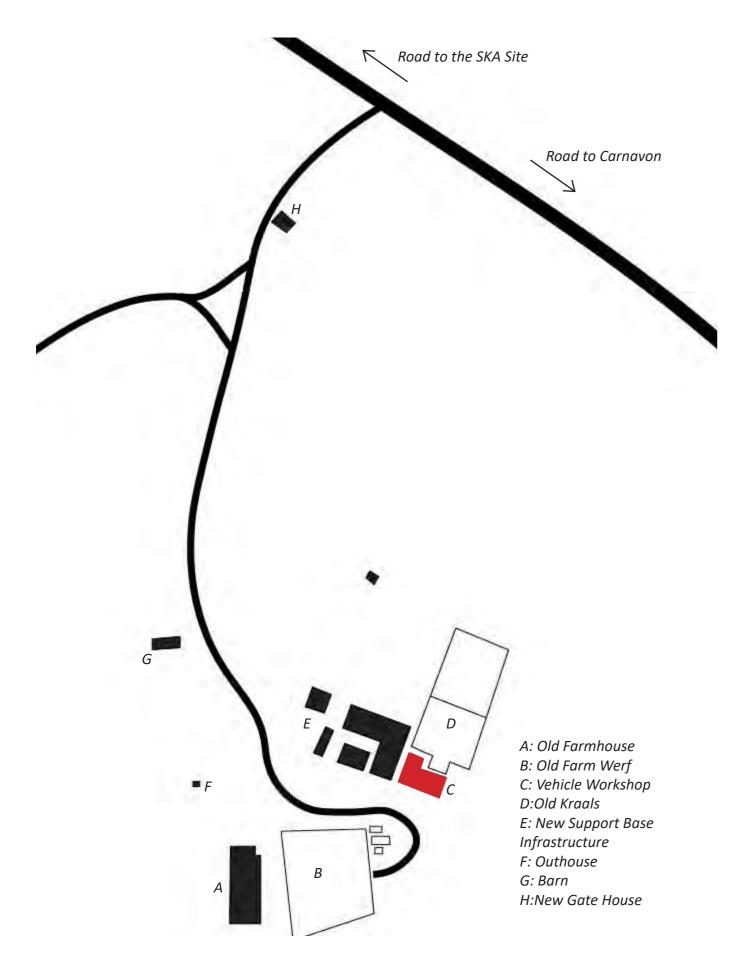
Site Plan of Klerefontein Farm highlighting the Workshop
